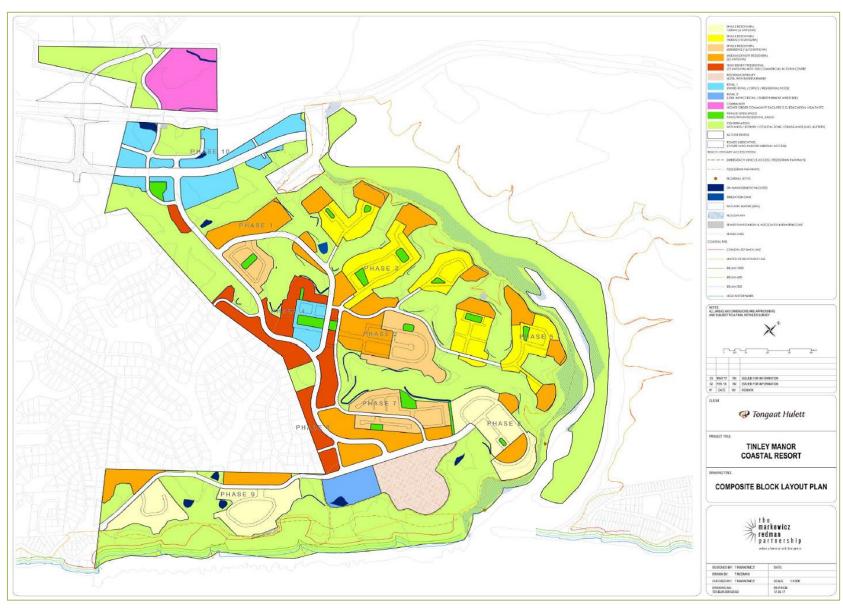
Tinley Manor Southbanks Composite Block Layout of the Site
